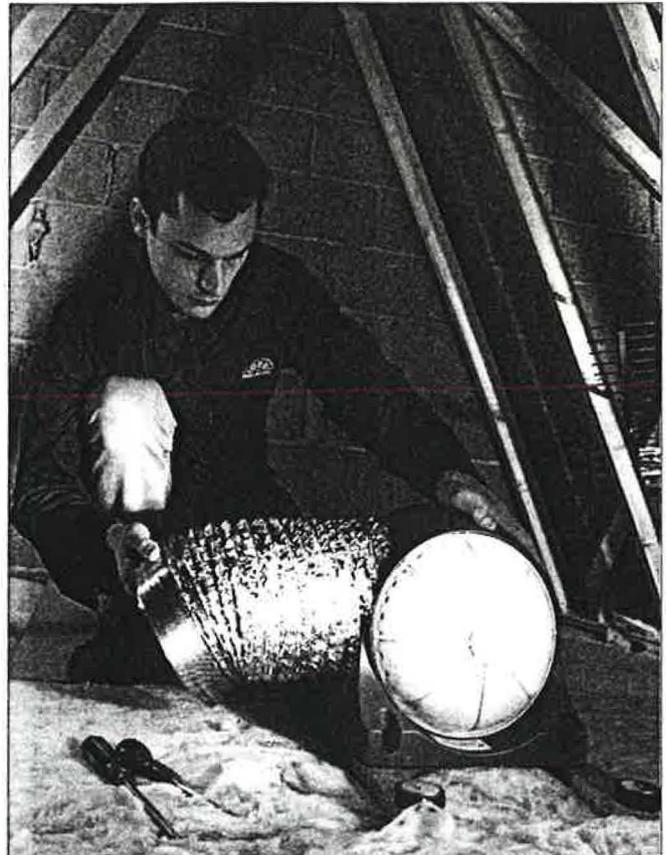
A typical installation of a positive ventilation unit, in this case a Home Ventilation Drimaster 5 unit being installed in a roof space.
